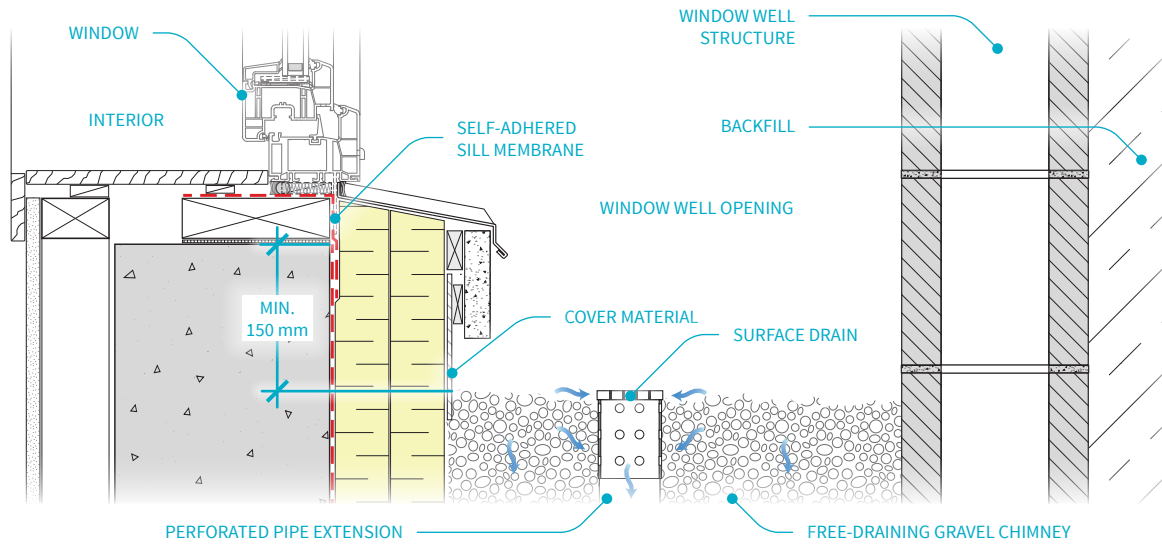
Window well section showing free-draining gravel and surface drain connected to foundation drain complete with perforated pipe extension (section view).
